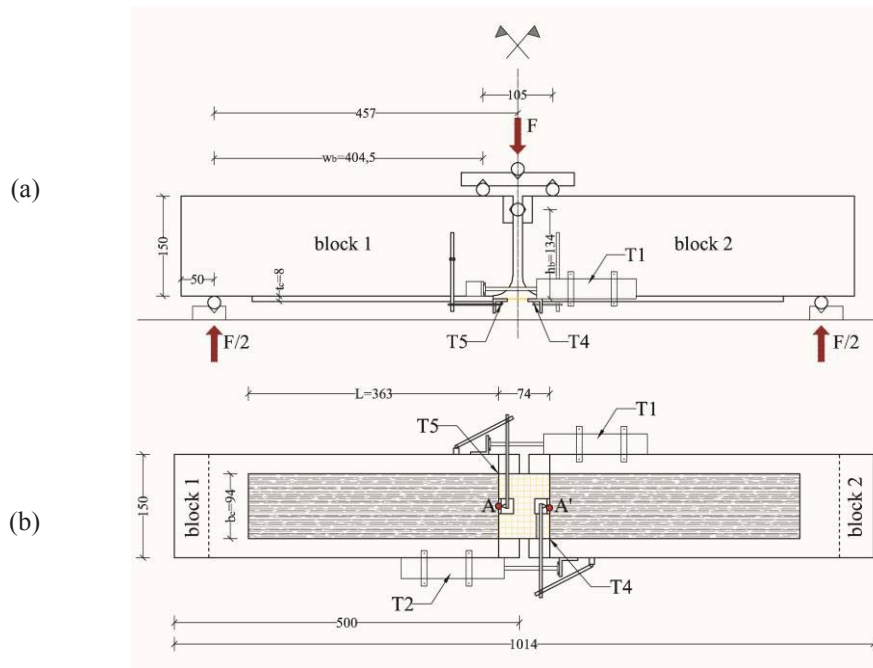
Test setup: (a) front; (b) intrados (dimensions are in millimeters).
